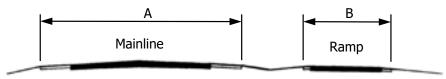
Approach roadway cross-section view for a mainline and a ramp that are carried across one bridge.
